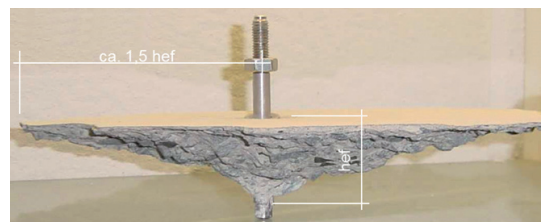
Concrete cone failure of a Fixanchor W-FAZ
